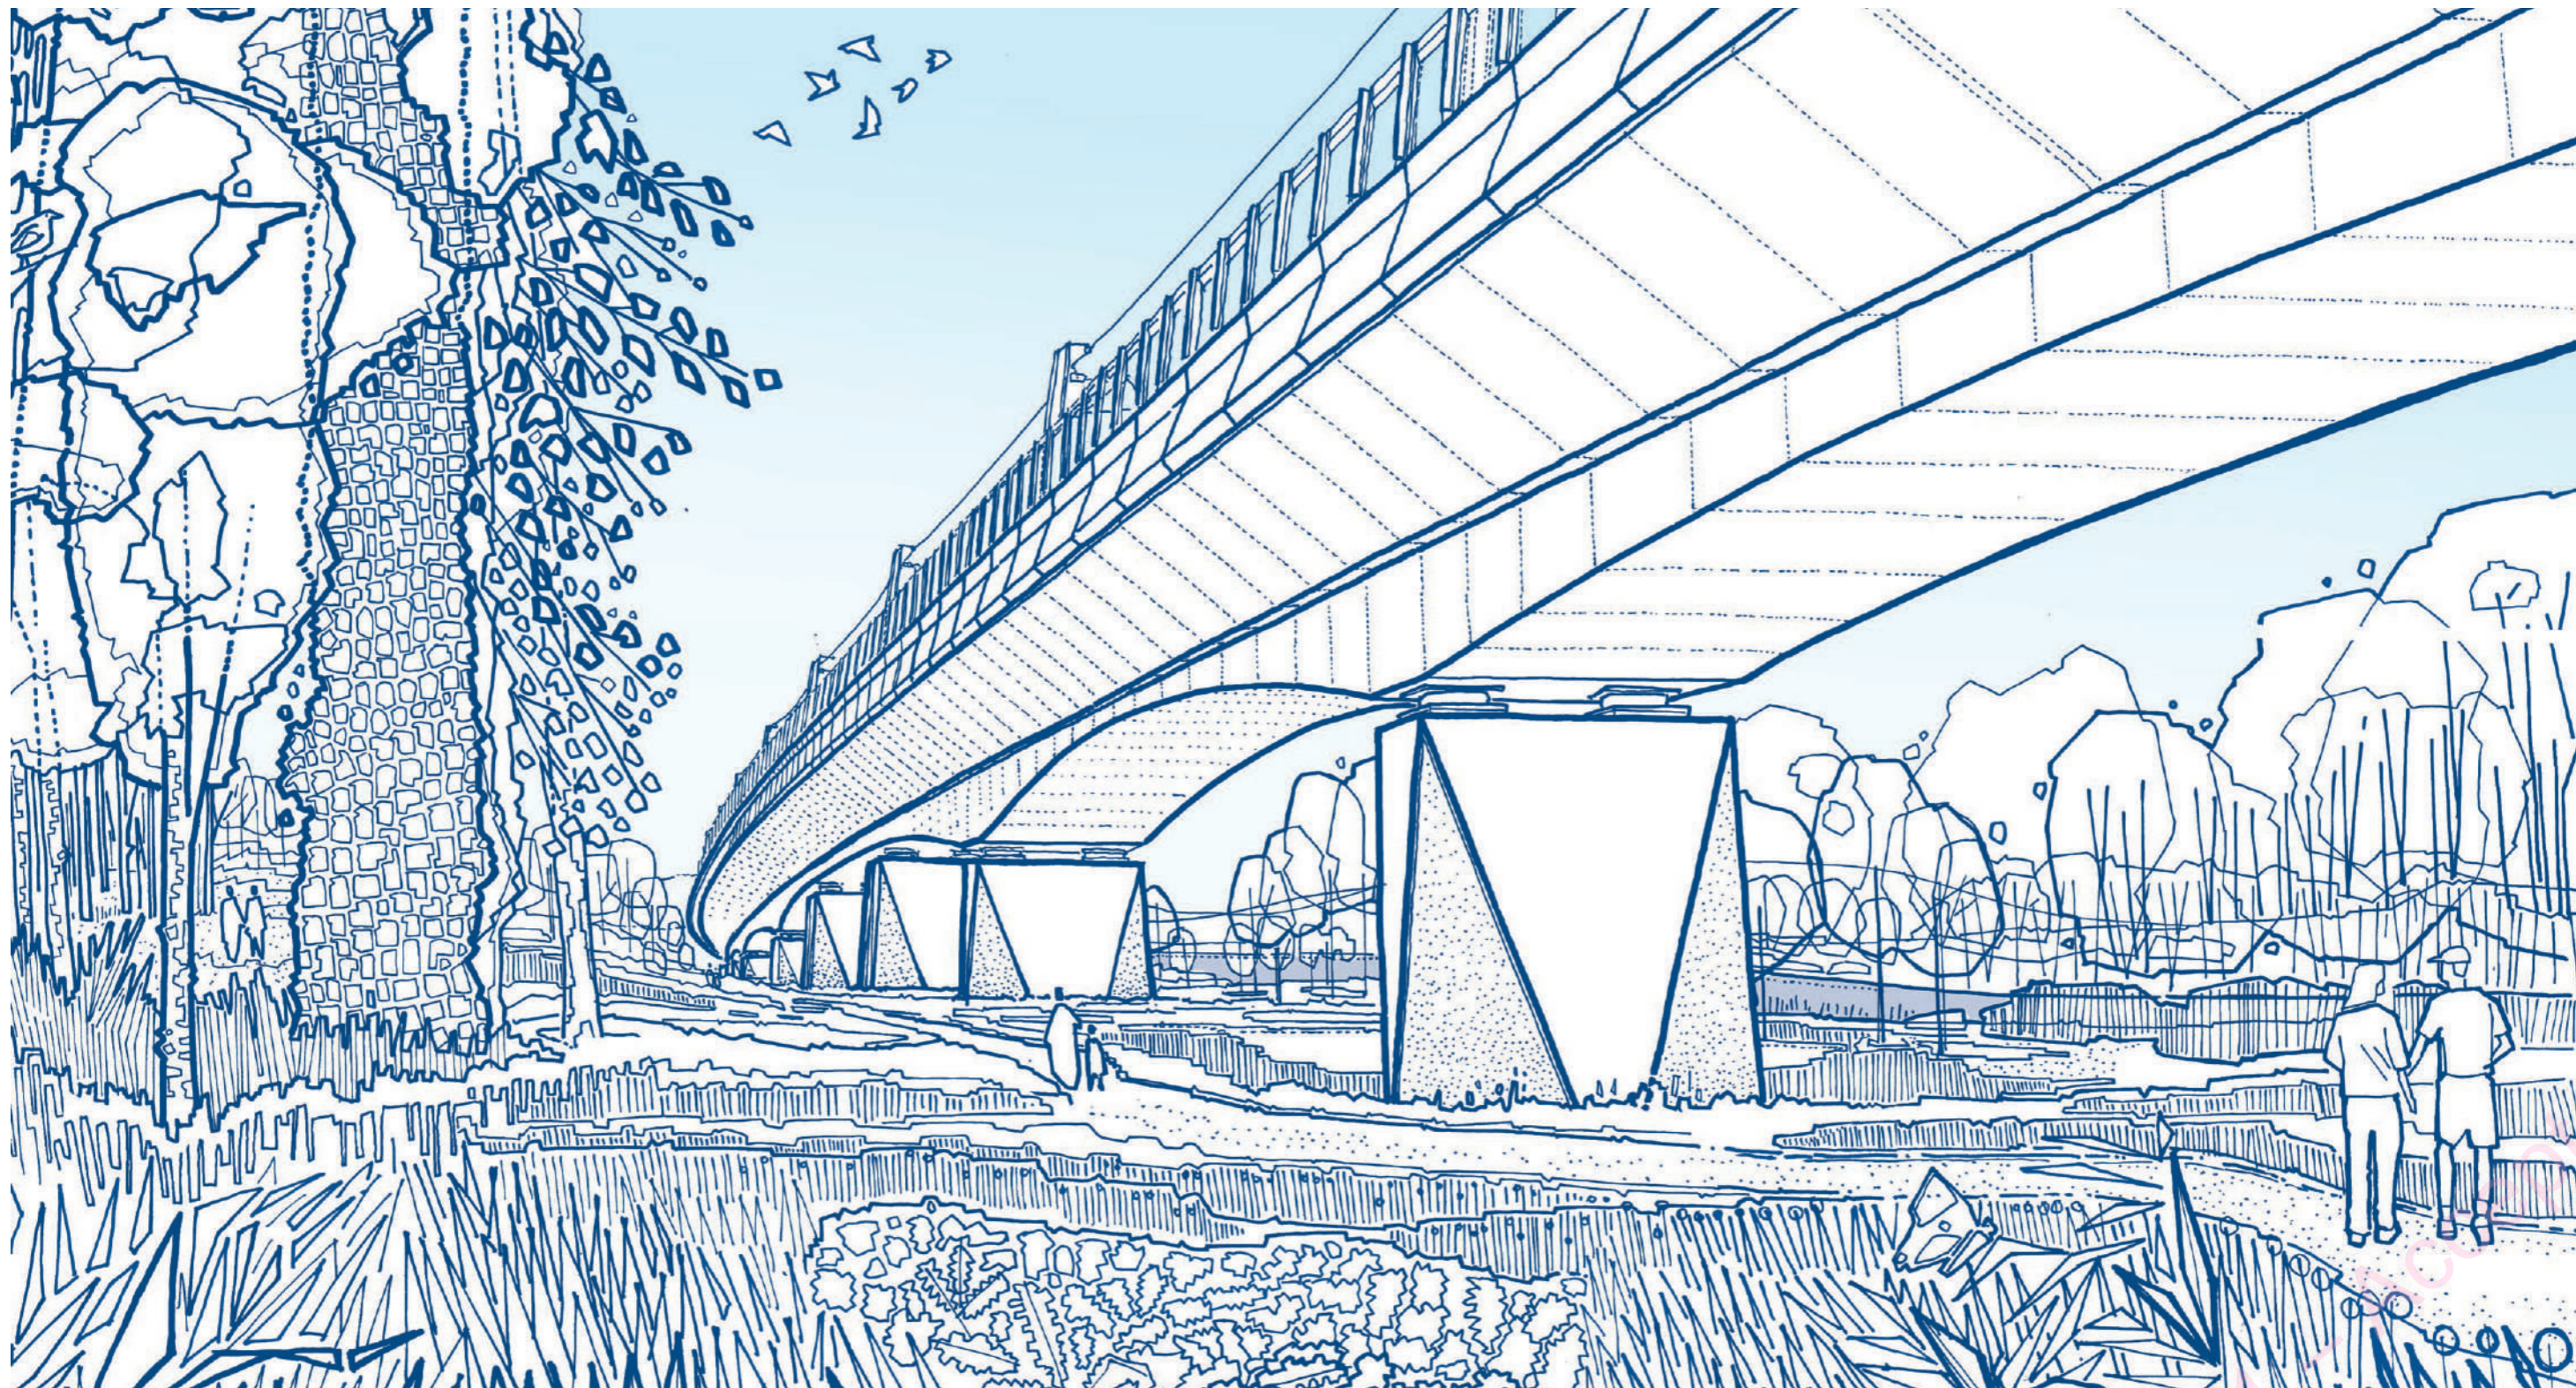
\_ Sketch - Woodland spans looking north near the River Colne crossing
